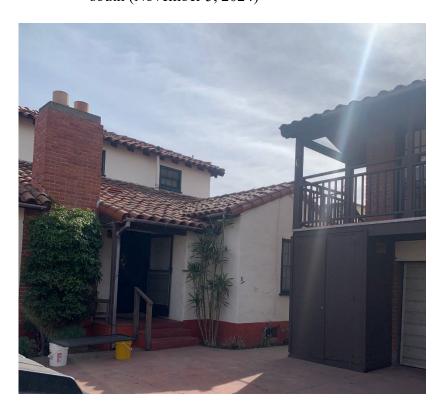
Wood corbels under roof eave at east elevation (November 1, 2024)
